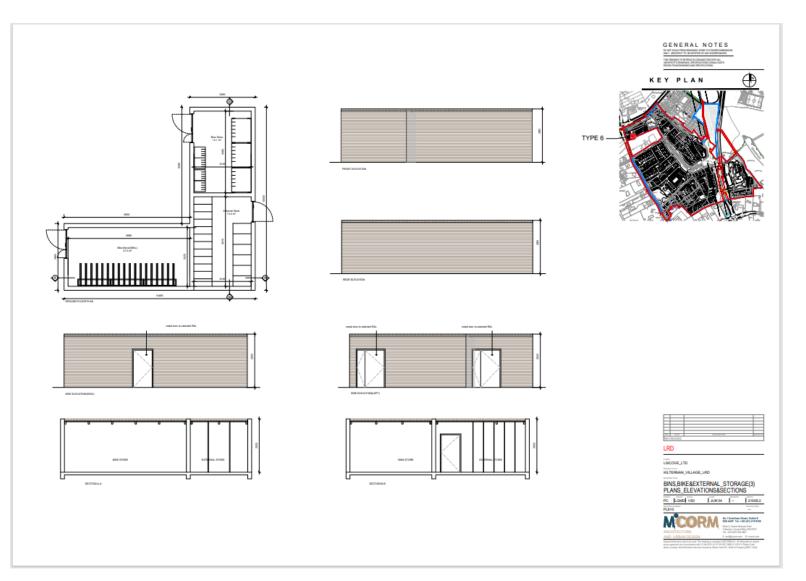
Internal Layout of Waste Storage Area Type 6
